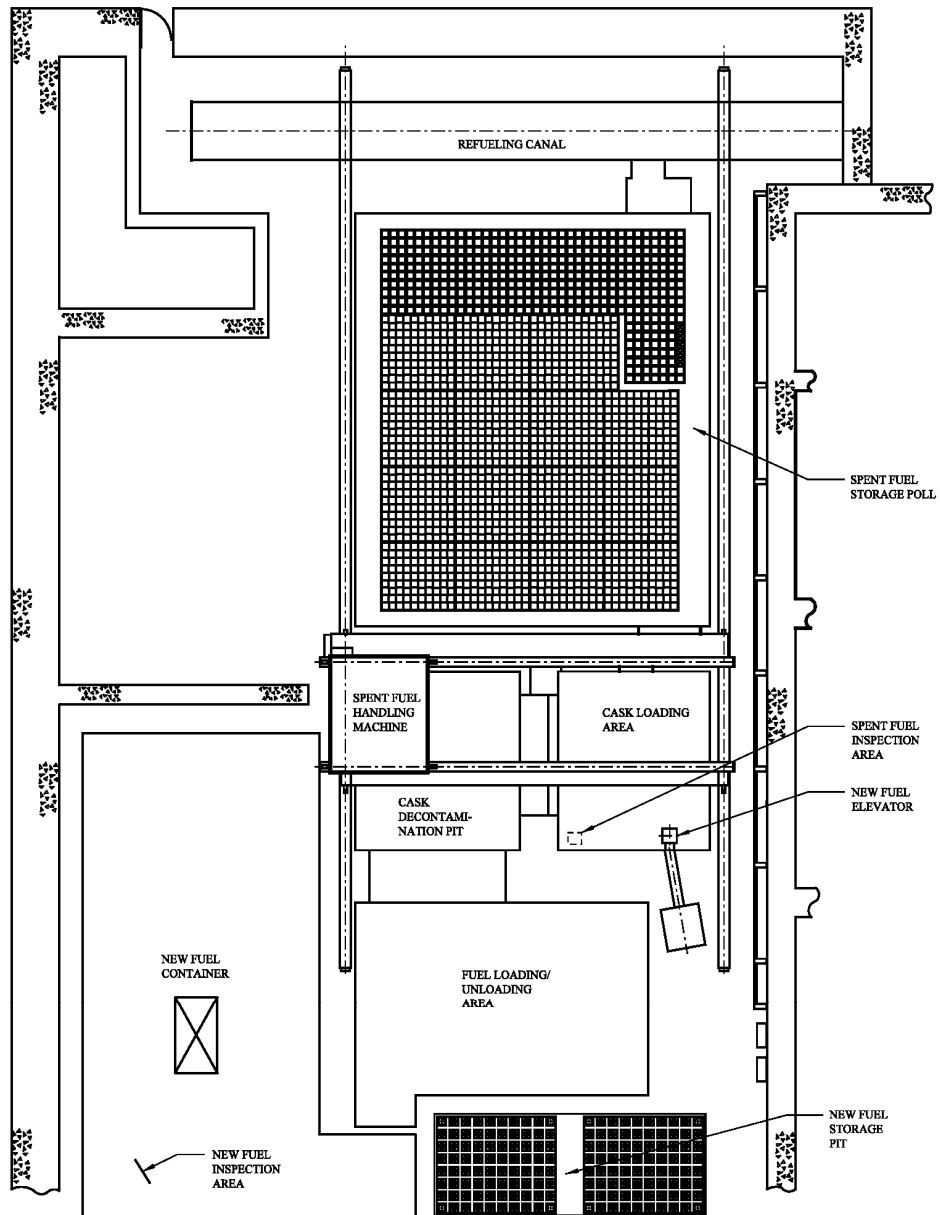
Fuel Building Layout (Related fuel handling)
